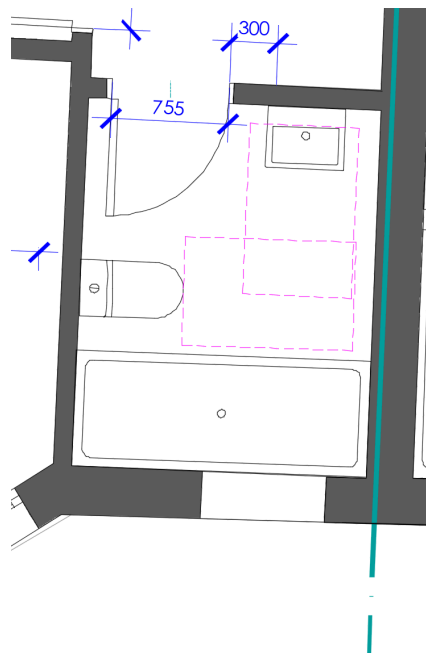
Sample plan of a proposed bathroom within Plots 1 & 2.
